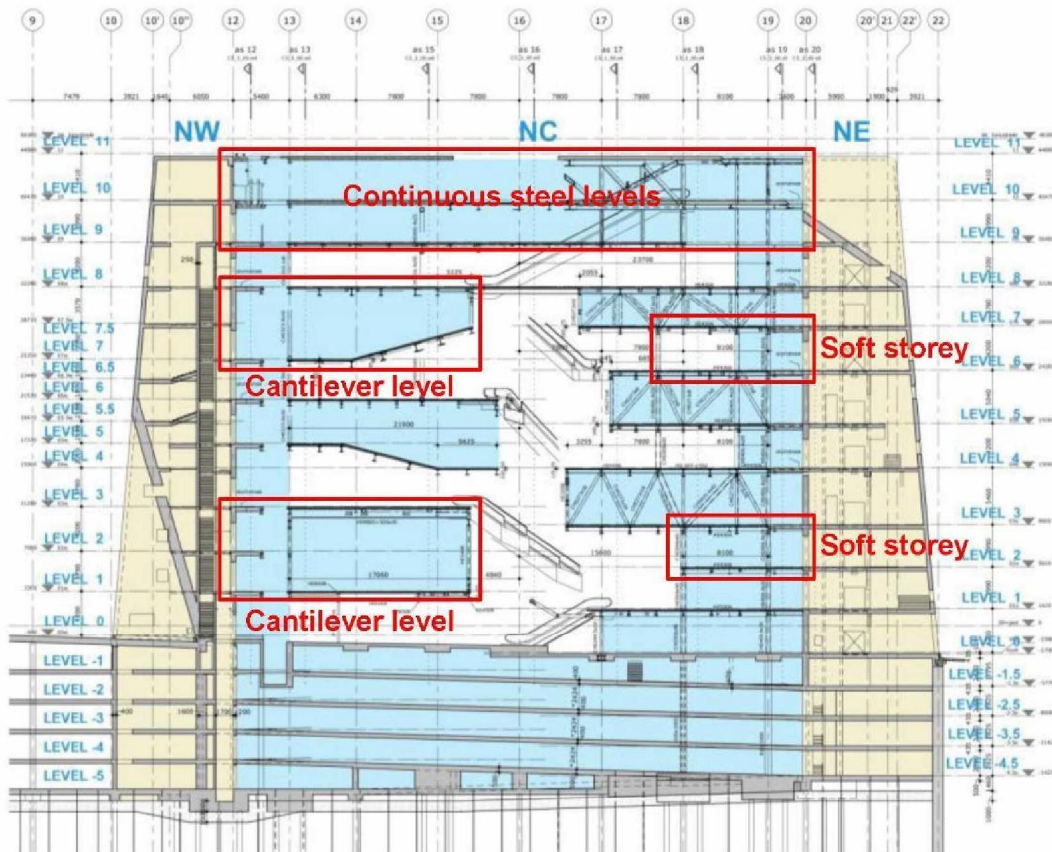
A typical section of the building (yellow for concrete cores and blue for central steel system)
